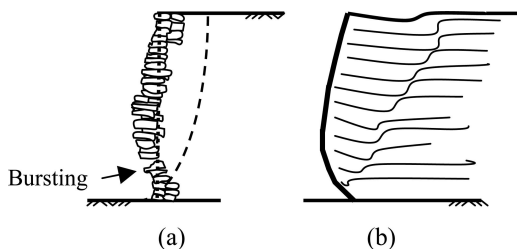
Failure mechanisms for (a) Victorian masonry walls (after Jones, 1979), (b) model reinforced soil walls (after John, 1983).
